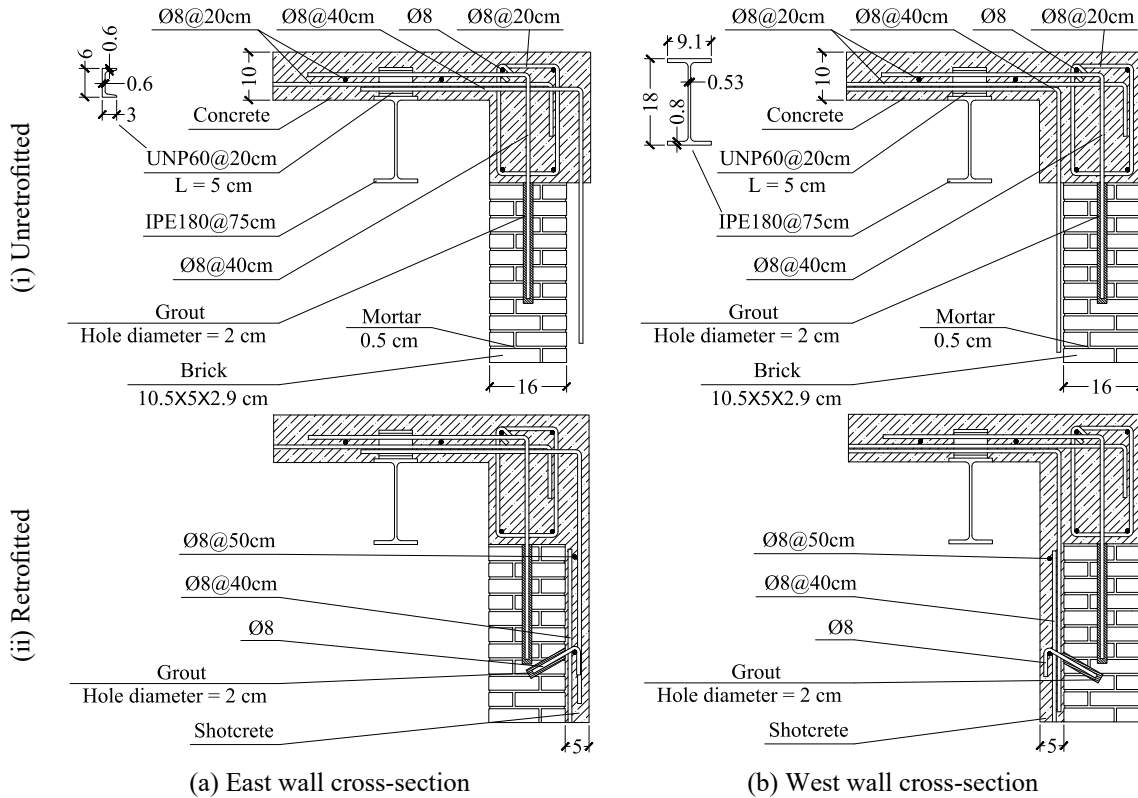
Roof-to-wall connection details: (i) unretrofitted, and (ii) retrofitted configuration (dimensions are in cm)
